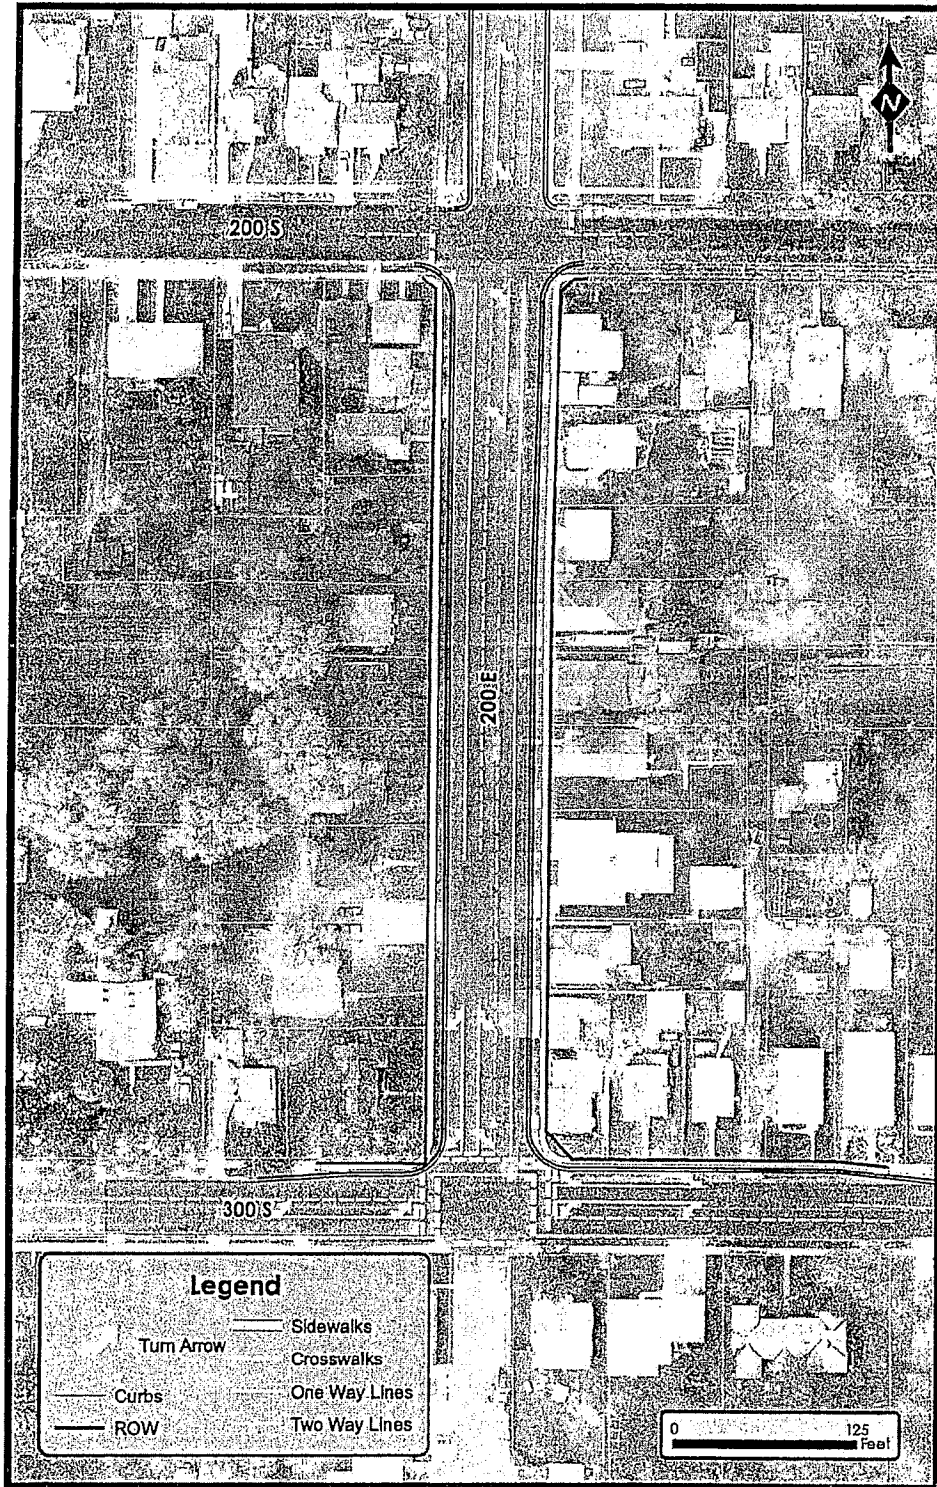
, Proposed Roadway Alignment 200 South to 300 South
